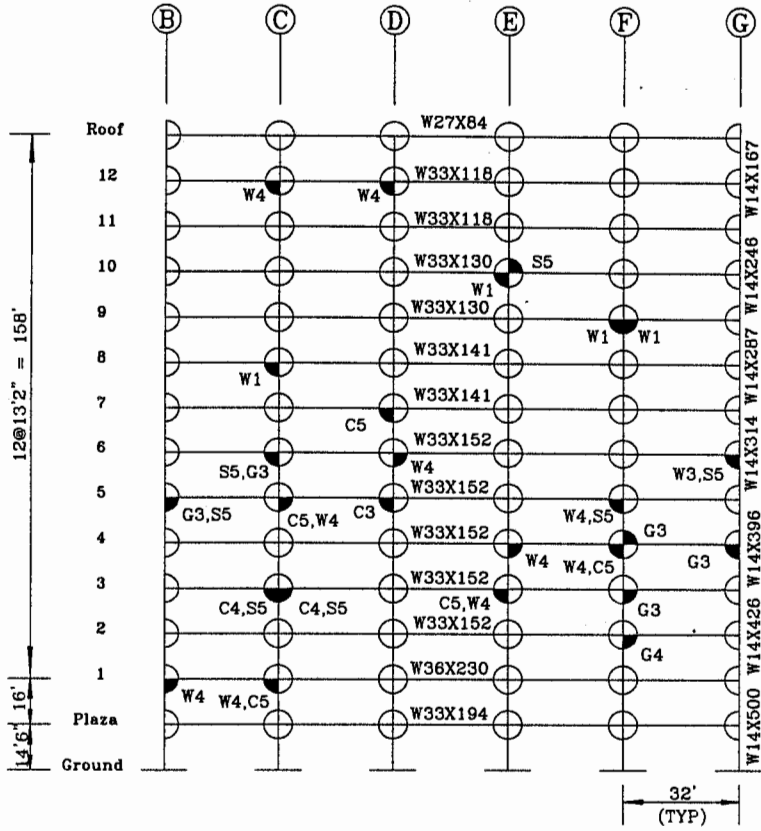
Elevation and Damage Pattern of the Frame (West Side)
